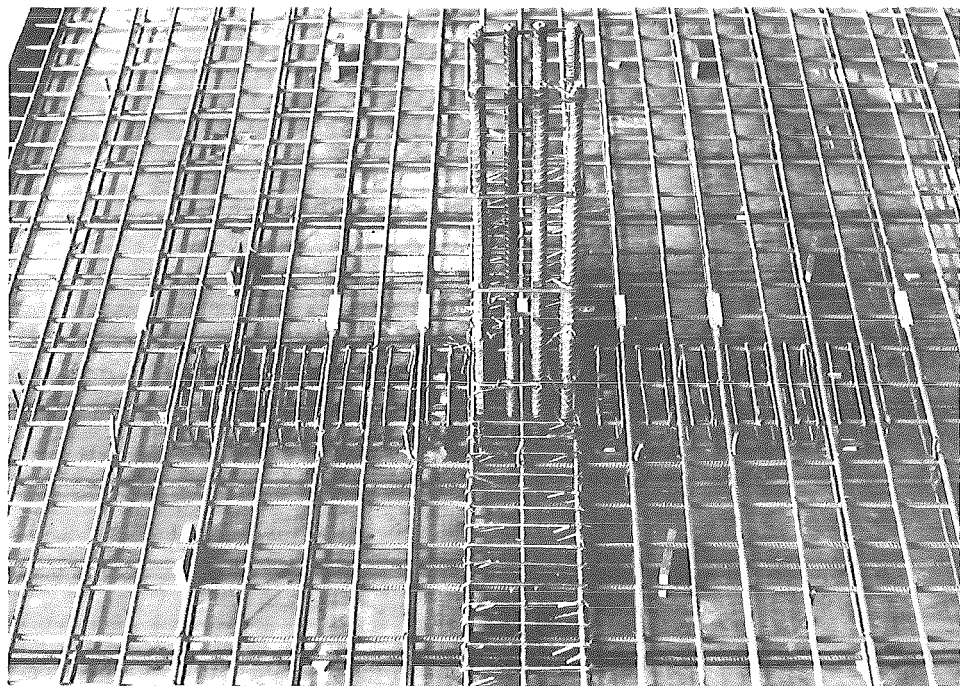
CLOSED STIRRUPS IN SPECIMENS 7CS & 8CS
